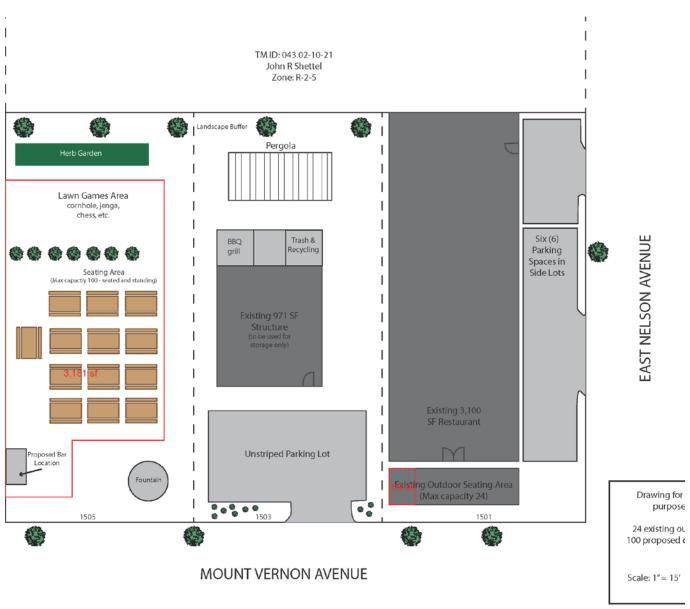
The applicant's outdoor dining proposal. The bulk of the outdoor dining is proposed on the lot at 1505 Mount Vernon Avenue, where the outdoor bar and lawn games would be. The applicant proposes to use the existing building at 1503 Mount Vernon Avenue as storage and is exploring using the building for additional bathrooms.
